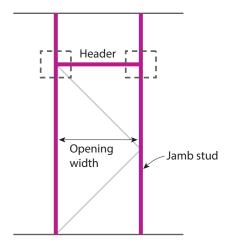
Alternative Header H1 Connection 'A-2' Elevation
